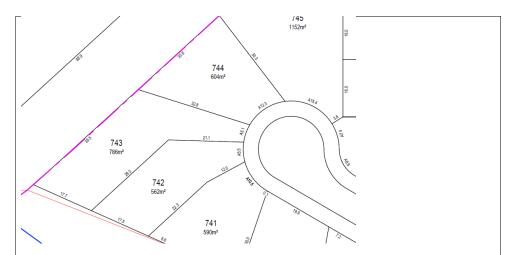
Excerpt from Lot Layout Plan by Maker ENG (dated 16/09/2022)
